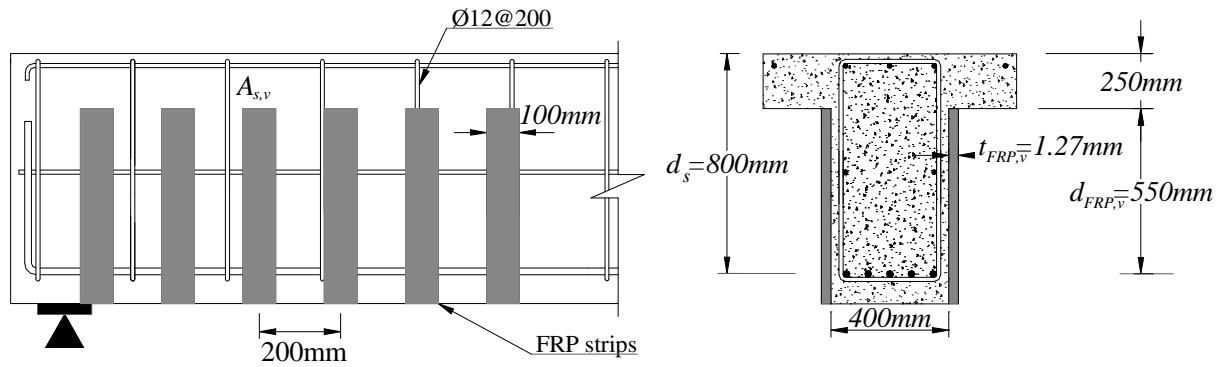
Geometrical dimension of FRP shear strengthening.
